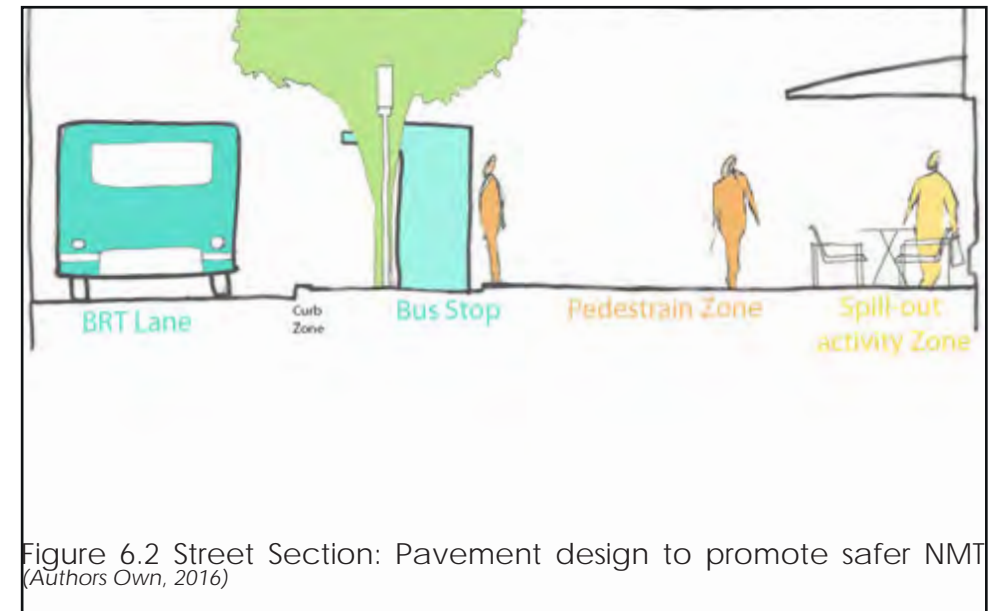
Street Section: Pavement design to promote safer NMT (Authors Own, 2016)
